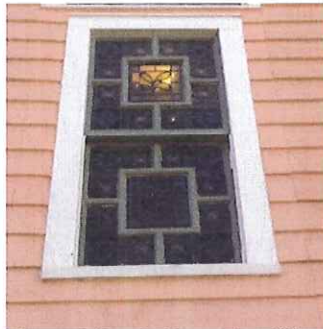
Patched exterior siding surrounding non-contributing element (outside view #1)
